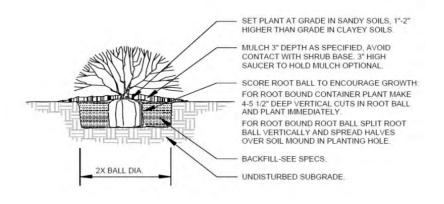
Typical Detail for Shrub Planting (UDFCD 2001).
